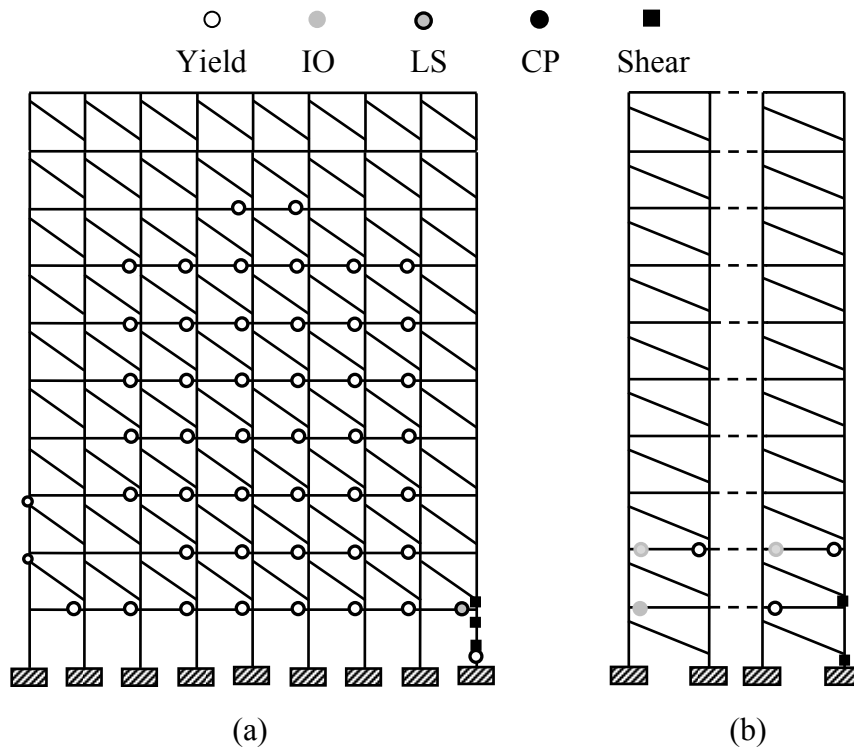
Collapse mechanism of the ten storey gravity load designed RC frame building with three bays open in the ground storey under bi-axial seismic excitation with major component in longitudinal direction; typical exterior frame in: (a) longitudinal direction; (b) transverse direction.
